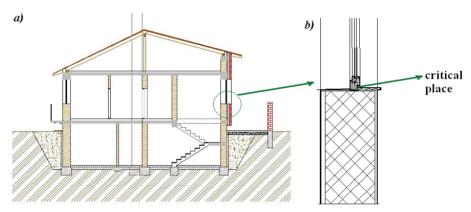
Thermal bridges—critical places of a house; a) section of a designed house with one thermal bridge circled, b) thermal bridge detailed [14]
